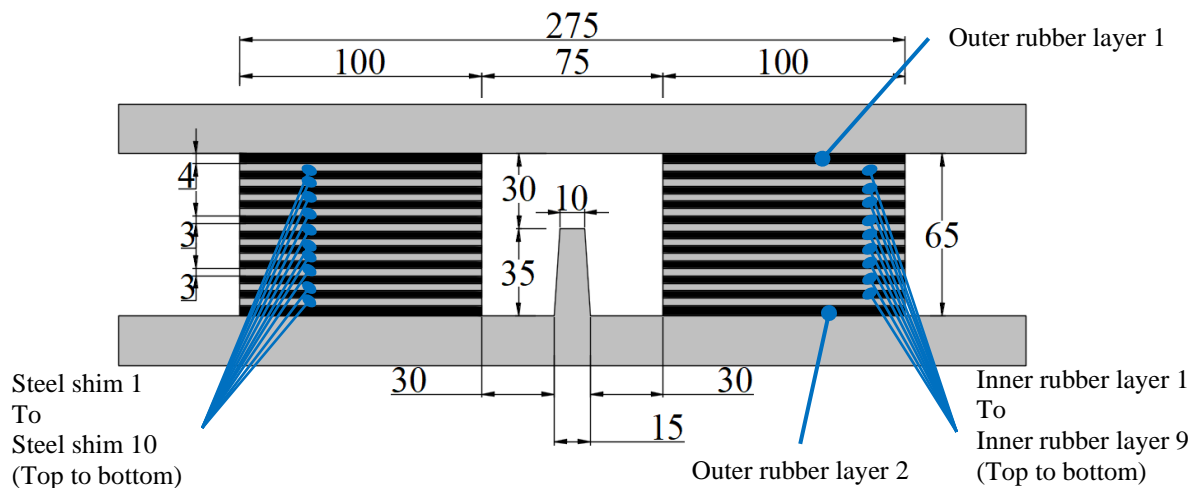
Dimension of components in elastomeric bearing equipped with proposed core-and-filler system
